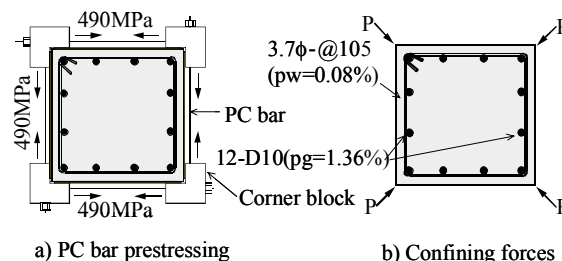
Detail of retrofit by PC bar prestressing and confining forces
